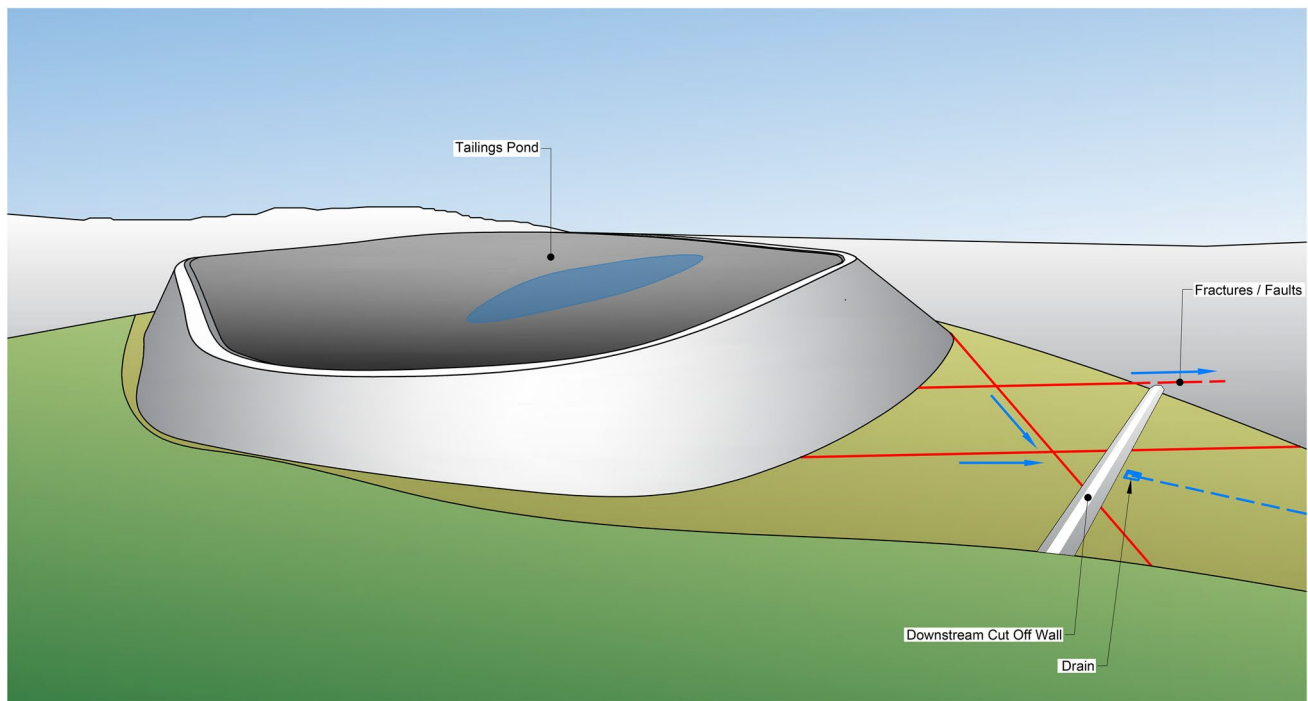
Schematic illustrating fracture flow around a cut-off wall through abutment
